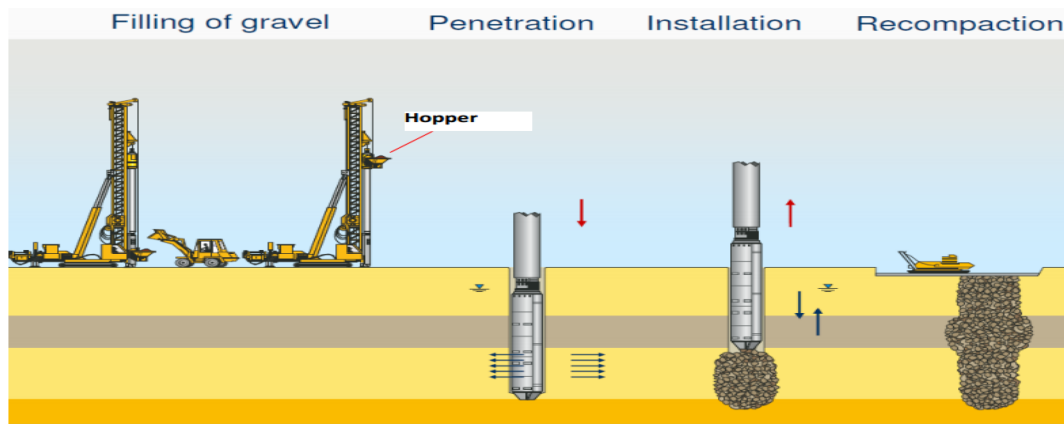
Casing pile stone column (Krishna et. al. [27])
